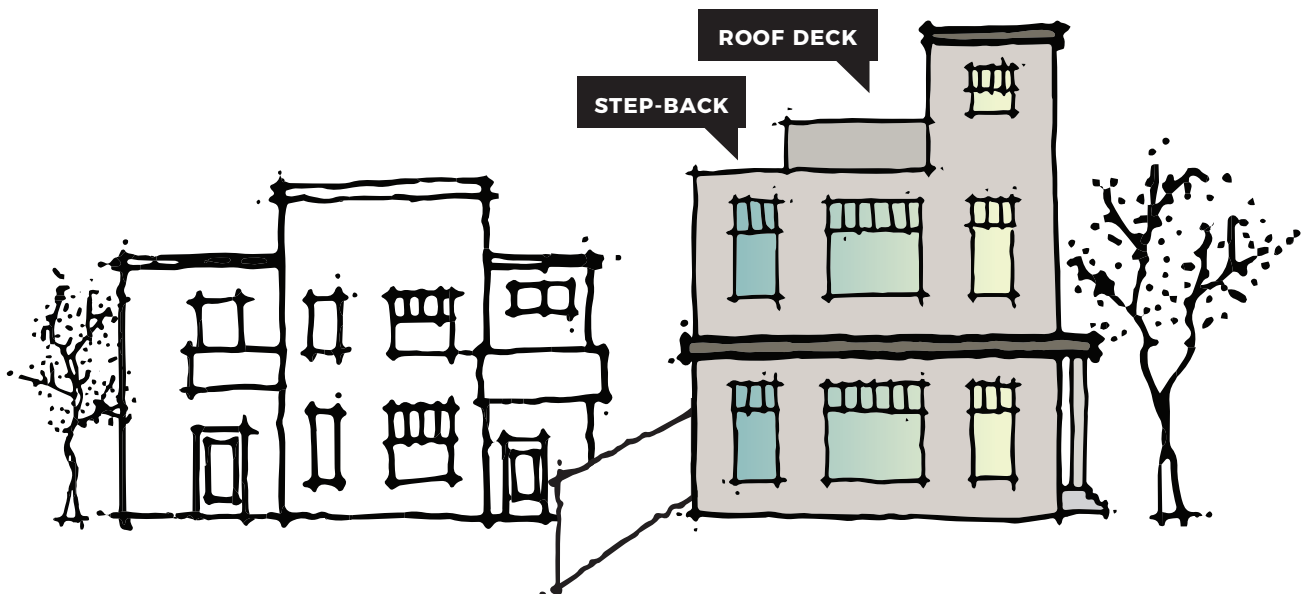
All roof decks along the project perimeter and abutting residential uses shall be stepped back a minimum of 5 feet from the roof edge, so that they are oriented away from and screened to prevent direct views of abutting residential neighbors.
